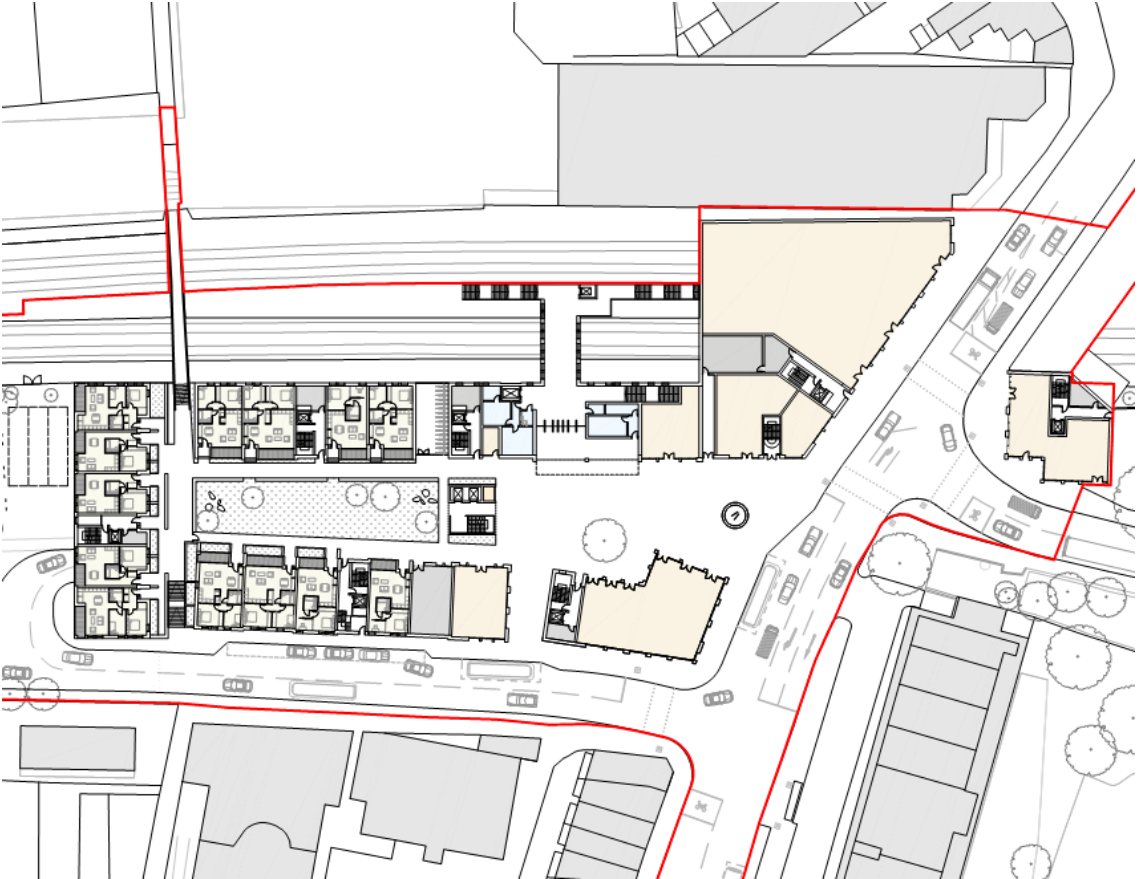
3: Zone A Blocks 1-7 ground floor plan
